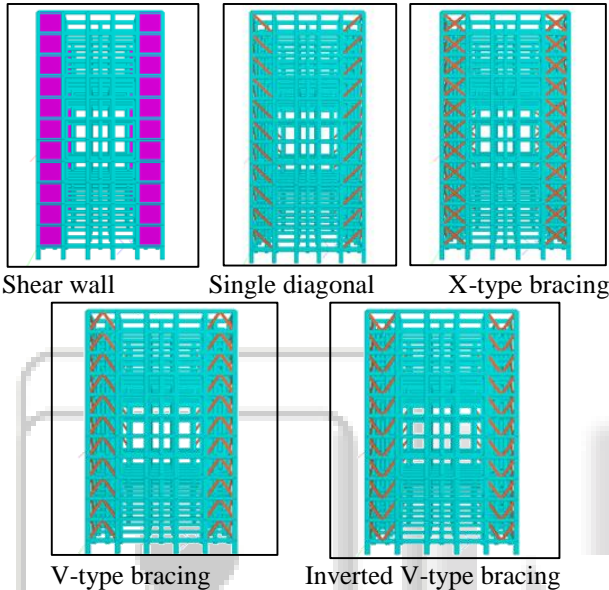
Elevation of G+10 storey building using different types of bracing pattern & shear wall used in corner position.
